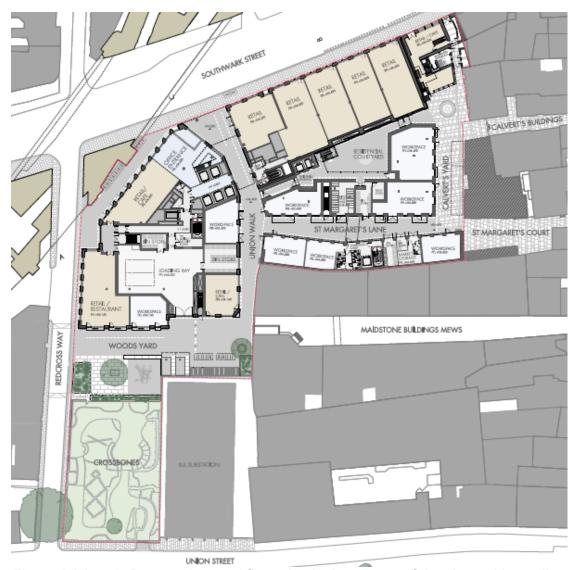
(above): Proposed ground floor plan in the context of the site and immediate surroudings.
